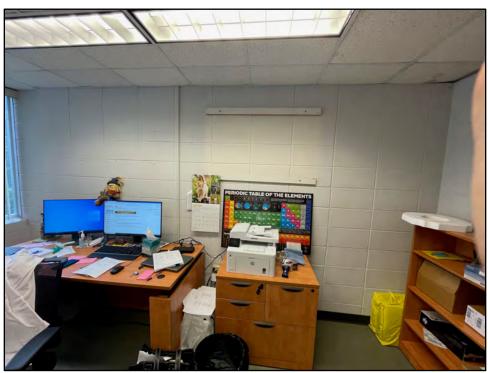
Interior view of B116 (Endale Soil & Plant Pre-Processing) showing light fixtures and ceiling tiles proposed for replacement, camera facing northeast.
